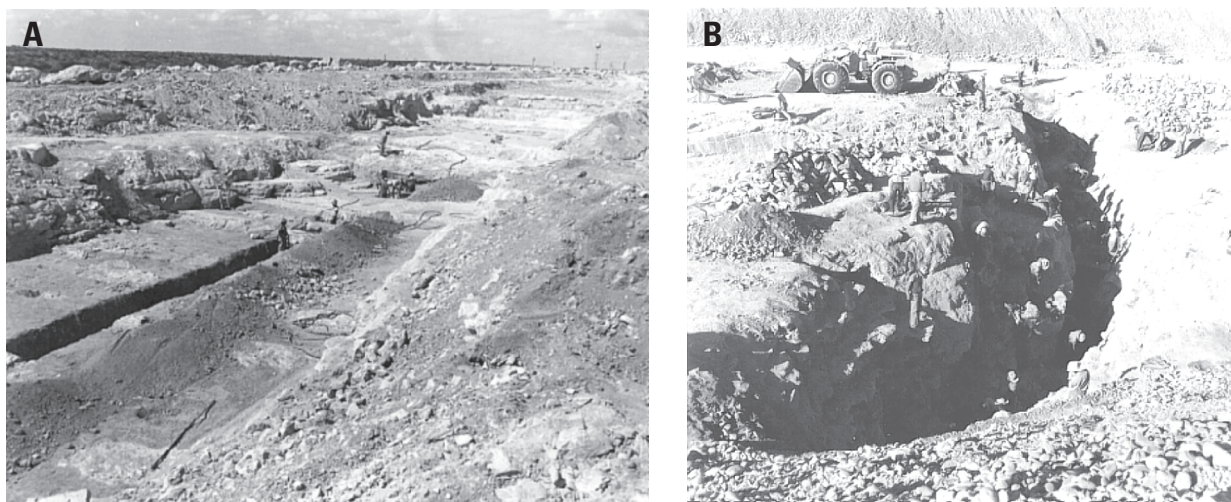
Amistad Reservoir dam construction, 1965: (A) excavation of dam foundation area along eastern embankment, and (B) excavation of ditch for curtain foundation along western embankment.
